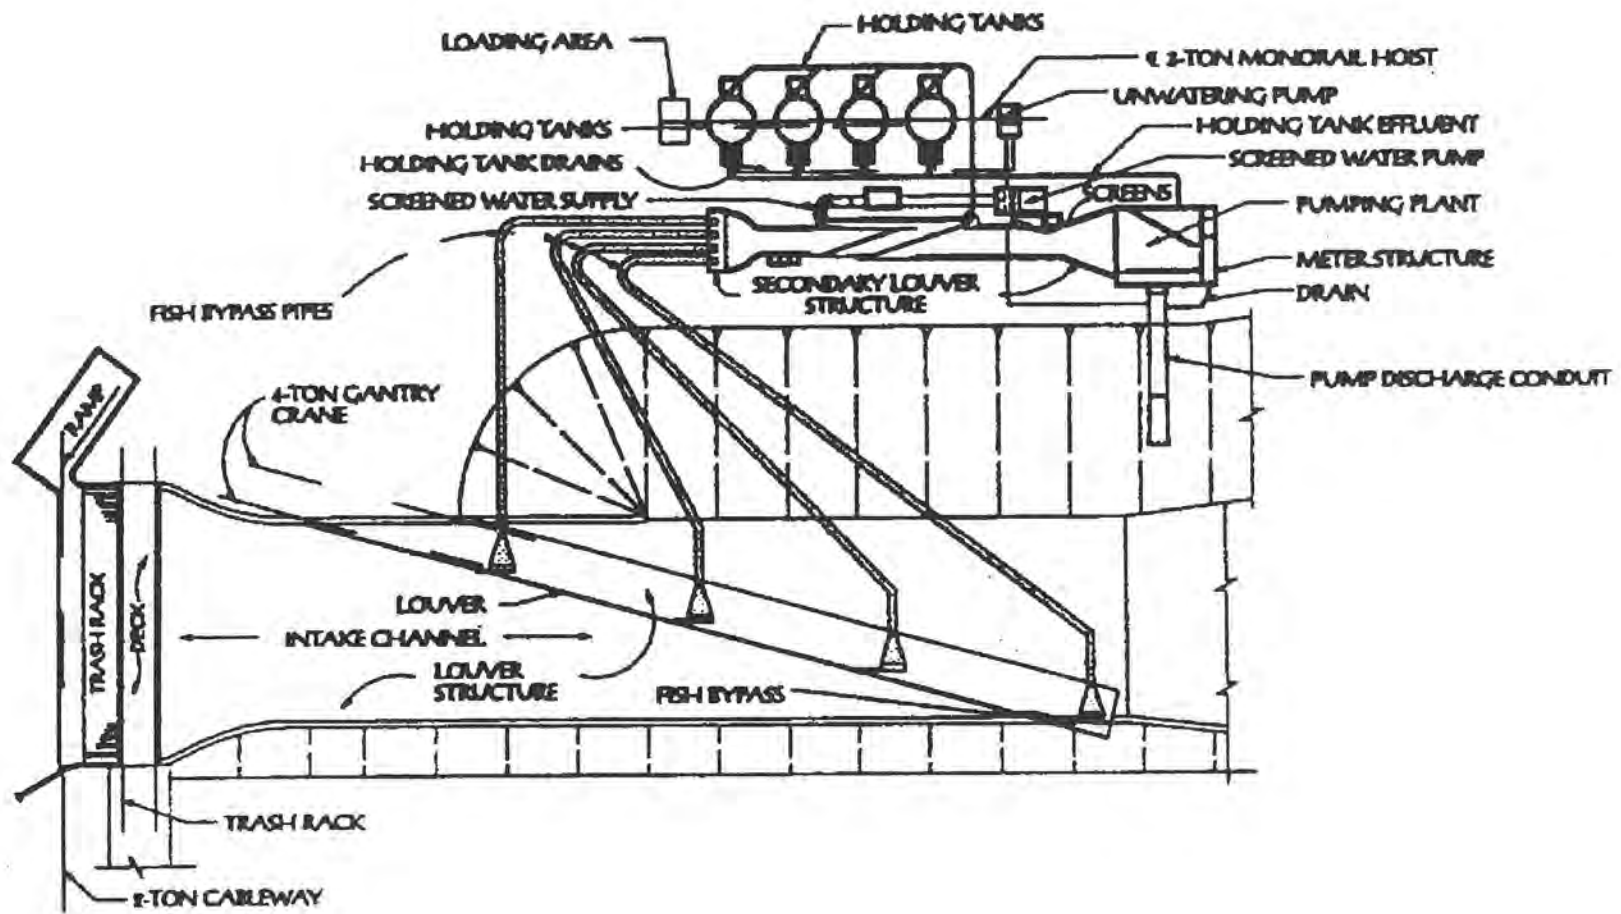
Plan view schematic of the Tracy Fish Collection Facilities.
